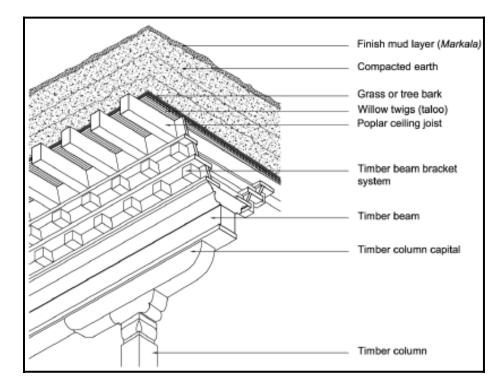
Typical roofing system configurations Source: Kuang Han Li, Conservation Approaches to Sustaining Traditional Ladakhi Roofing Systems, 2005
